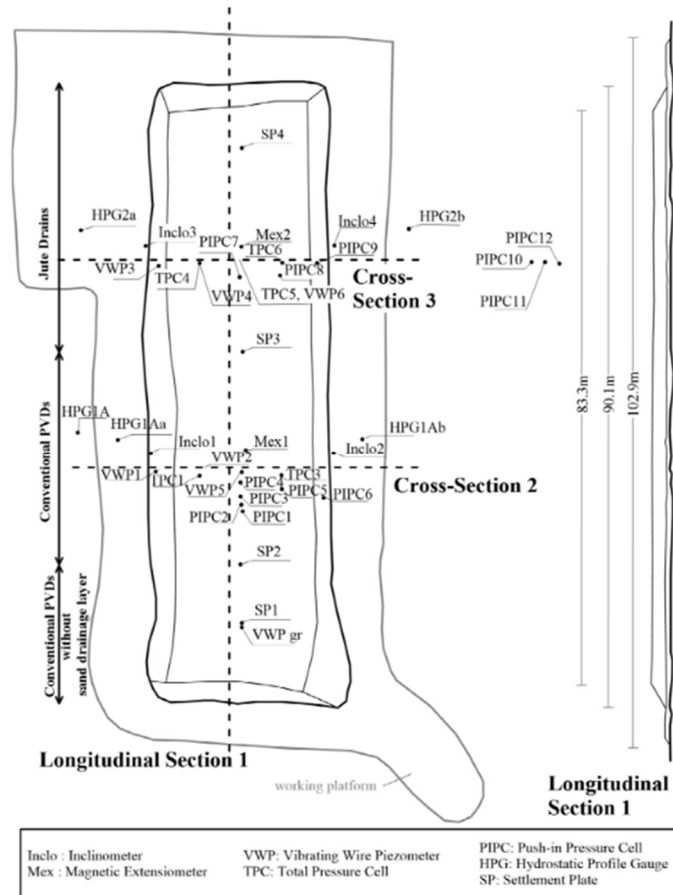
Plan view of instrumentation at the PVD-improved embankment in Ballina (Kelly, et al., 2017).
